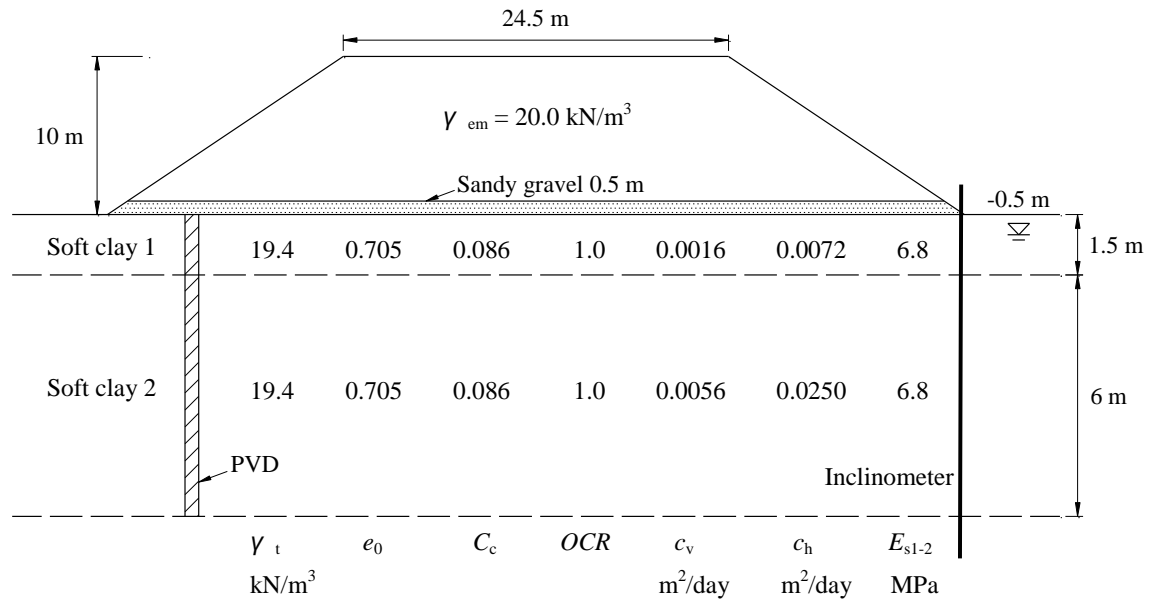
Cross-section and soil profile of embankment at K89 + 110
